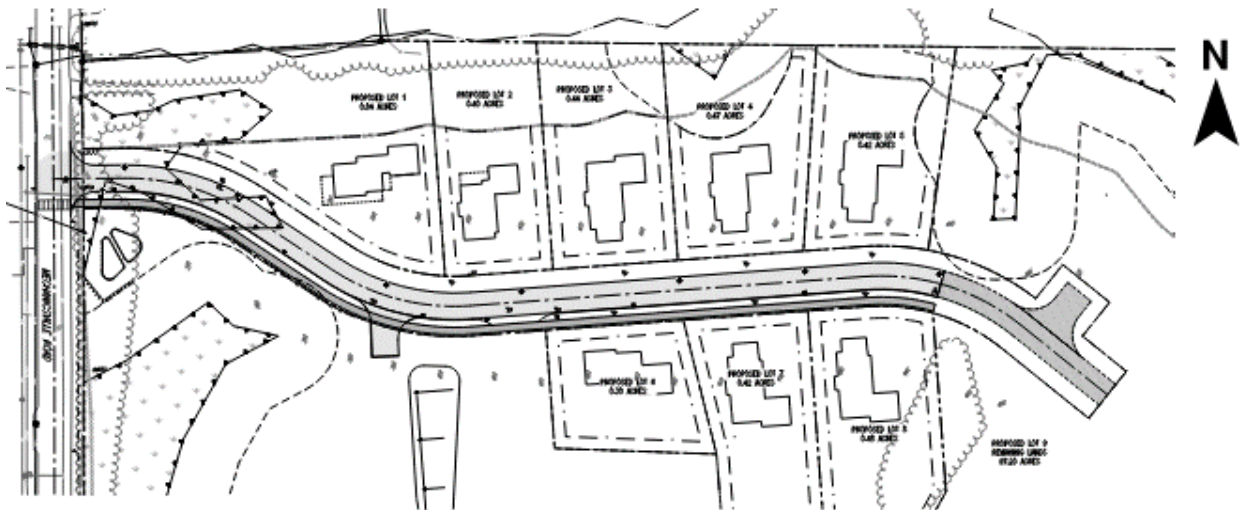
SITE PLAN (ENGINEERING VENTURES, 3/18/22)
